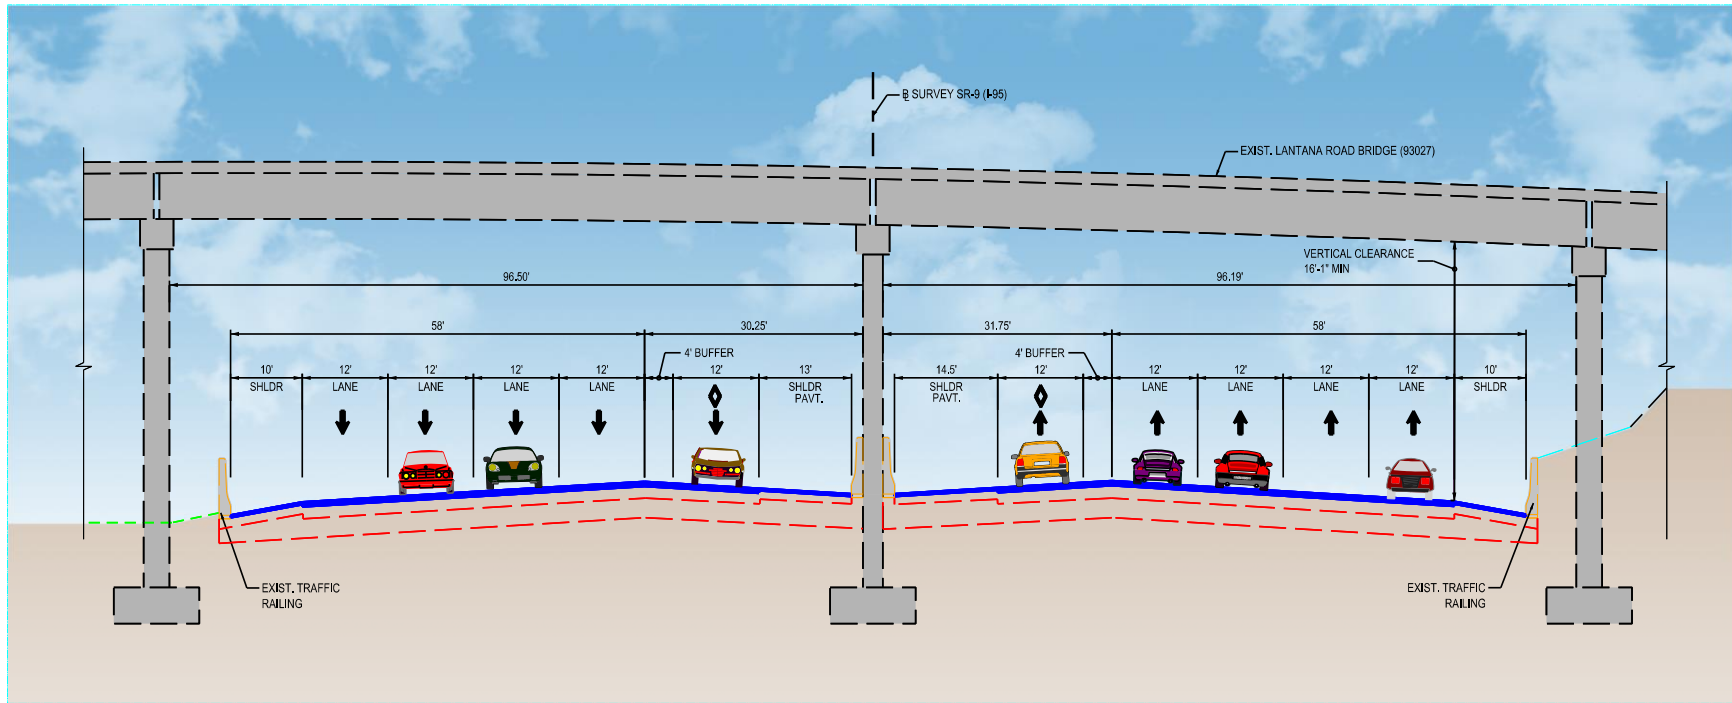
Typical Section – SR 9/I-95 Underneath Lantana Road
